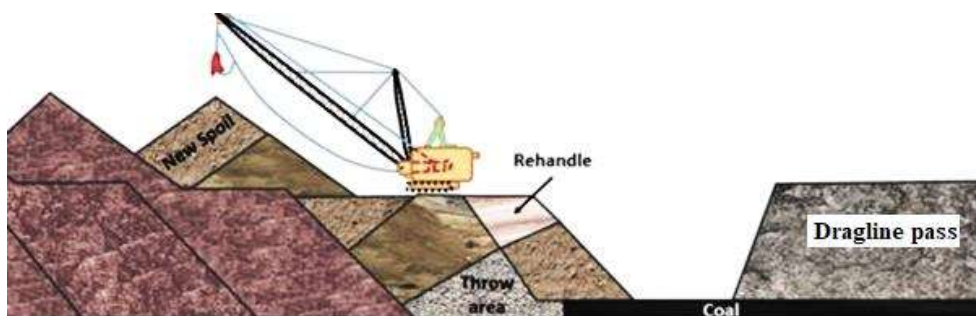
Cross-sectional view of extended key cut method (Akhundov and Demirel,2019).
